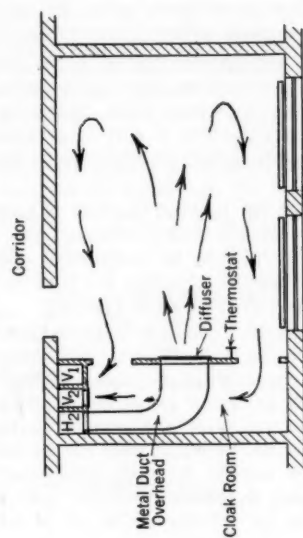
PLAN OF A CLASSROOM IN A SCHOOL VENTILATED BY A CENTRAL FAN
